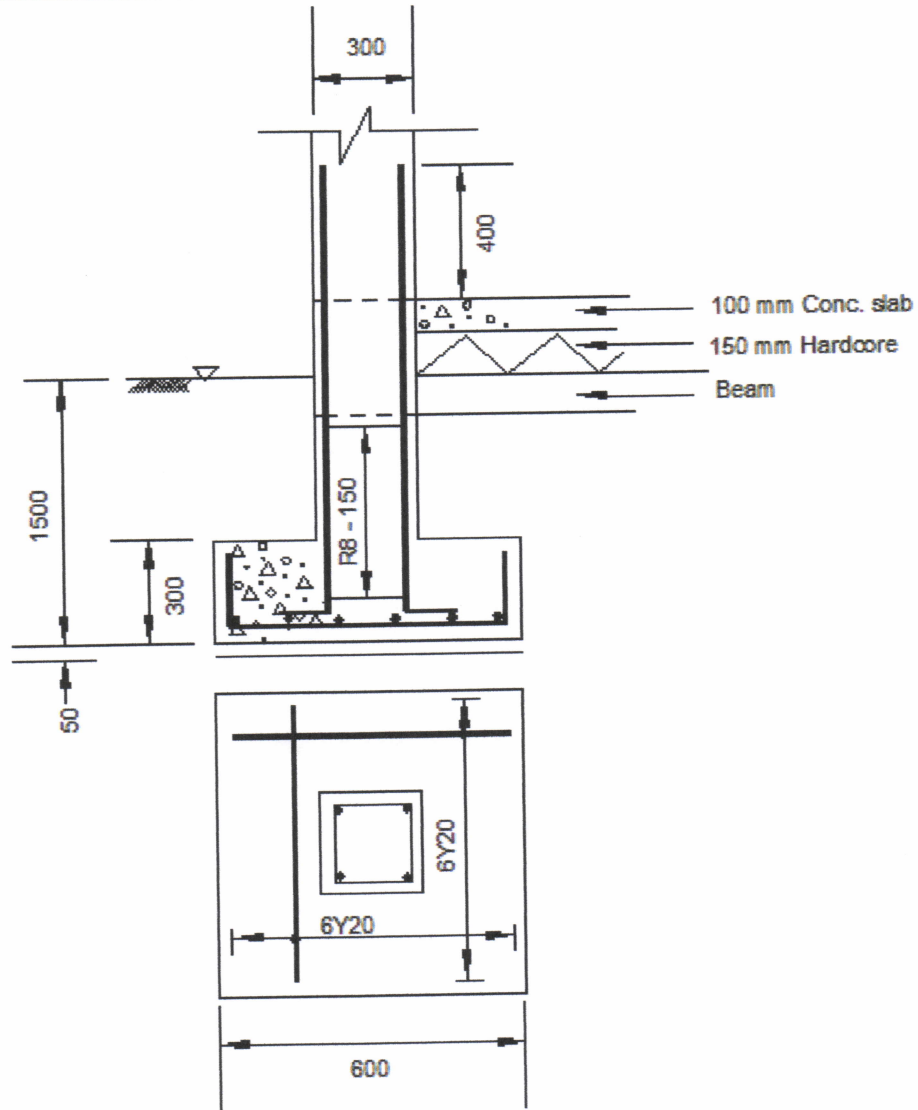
(c) : CROSS SECTION AND PLAN FOR PAD FOOTING
